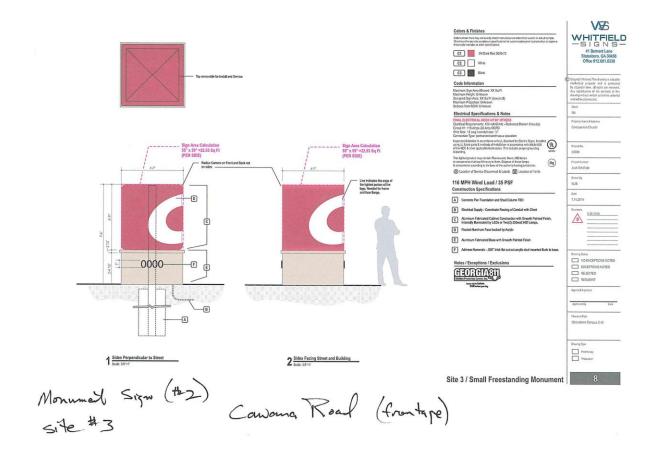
EXHIBIT C: PROPOSED SIGNAGE PLANS (CONT) P
